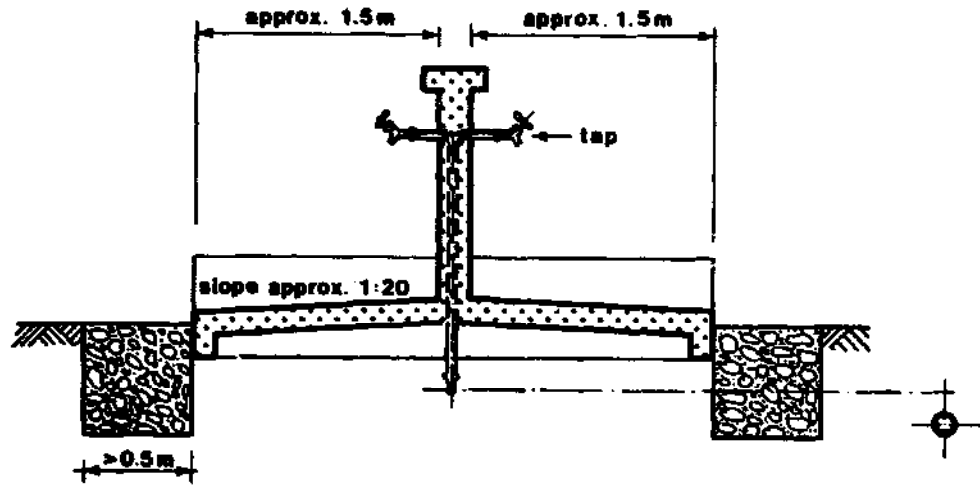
FIGURE A: CROSS-SECTION OF STANDPOST WITH TWO SCREW TAPS AND A CONCRETE PLATFORM
